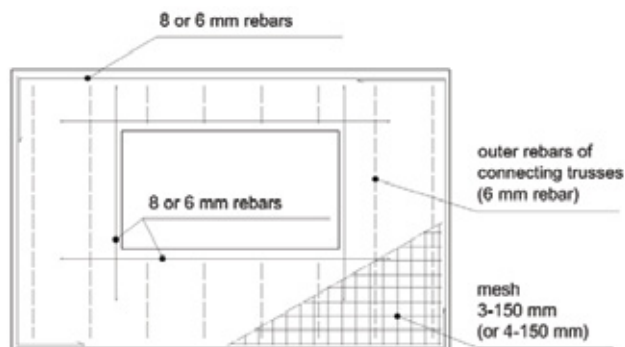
Typical reinforcement in the outer layer of concrete facade panel [4].
